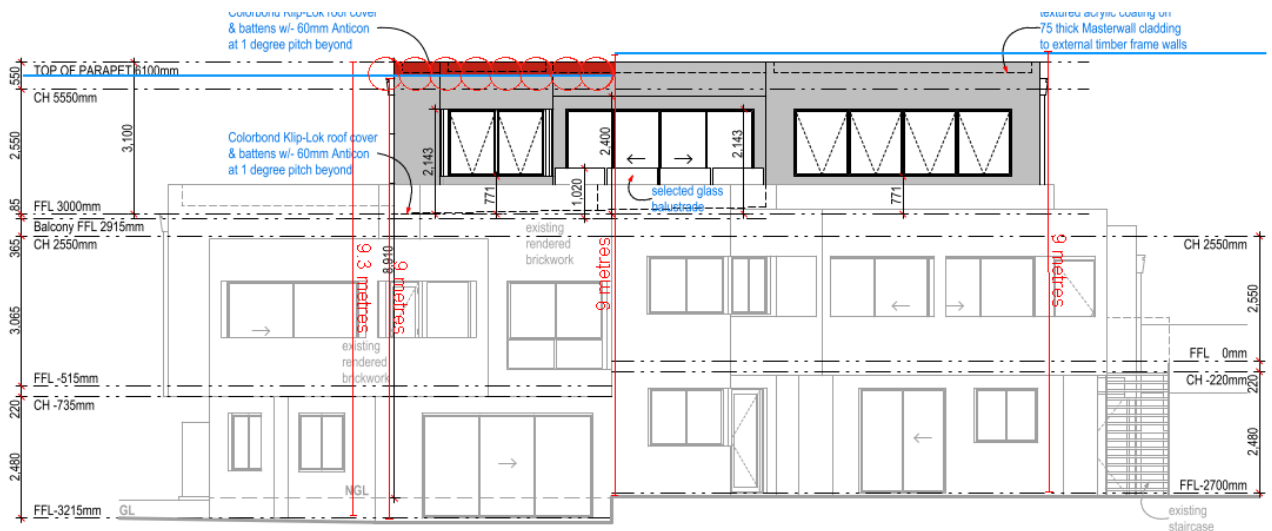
Eastern Elevation of the proposed works. The blue line denotes the deemed to comply height limit of 9 metres and the red shading denotes the modest section of wall above the deemed to comply limit.
